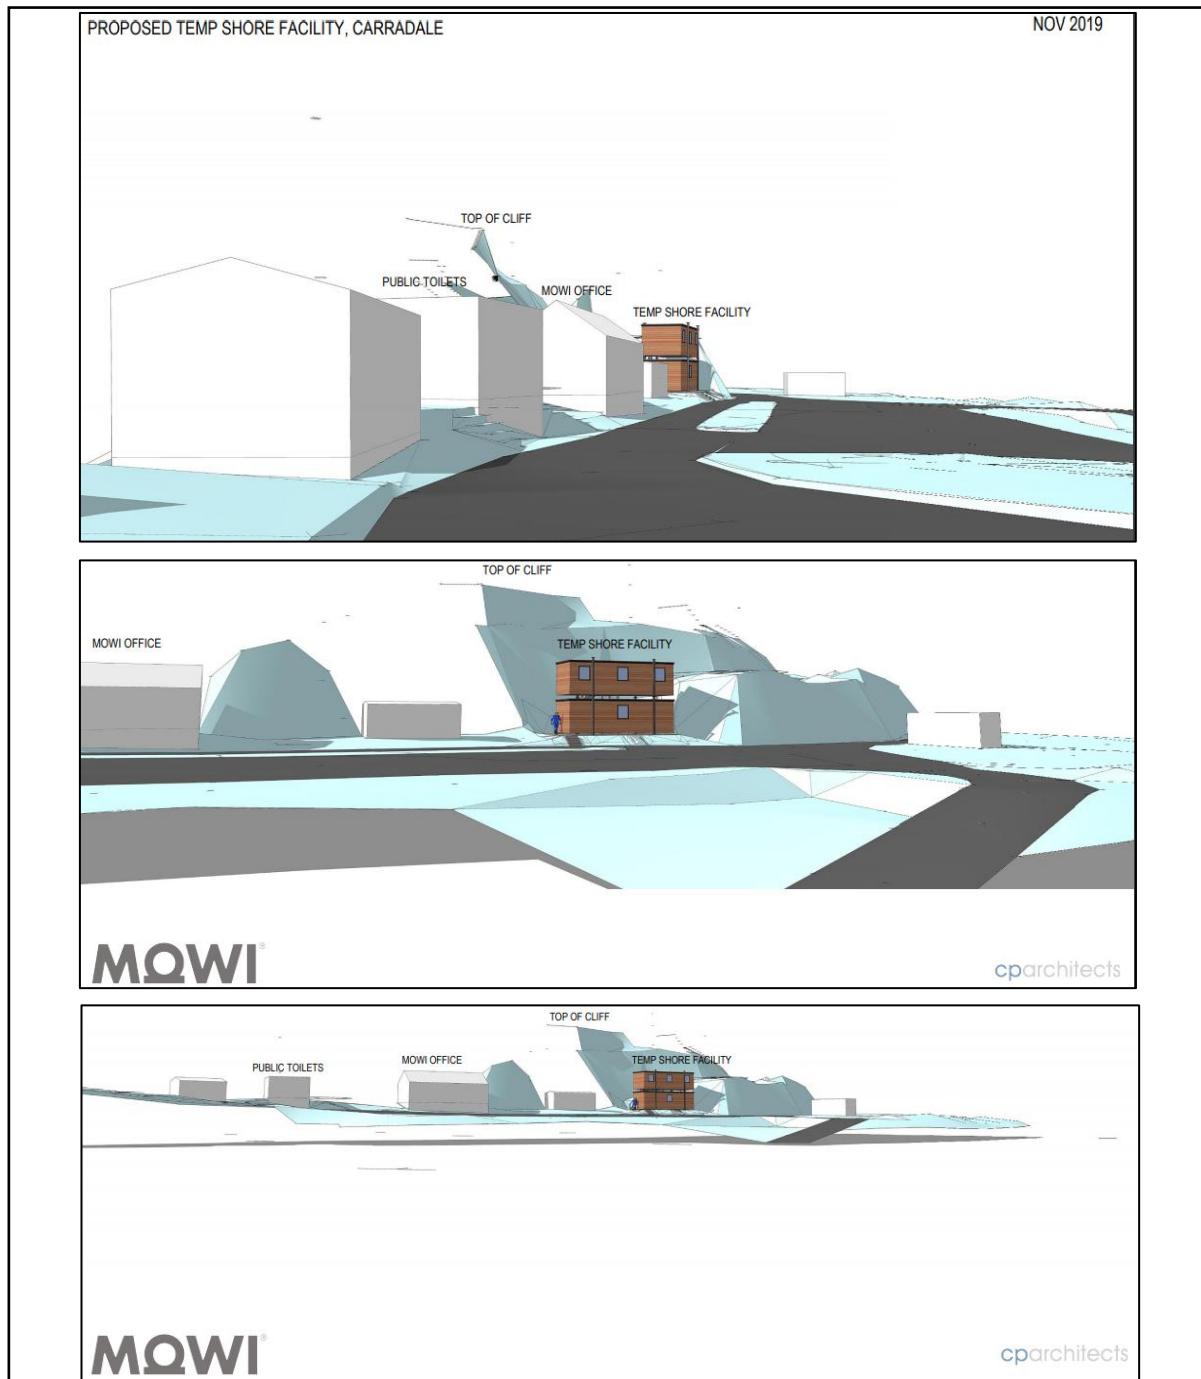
Architect drawings of potential shore base facility at Carradale Harbour.
